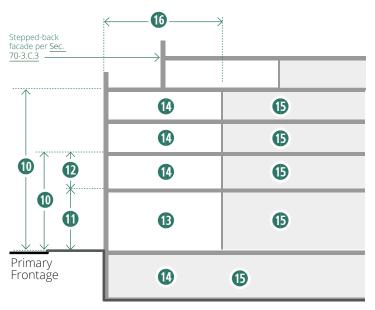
C-3. Storefront Building Section: Height & Use Requirements
